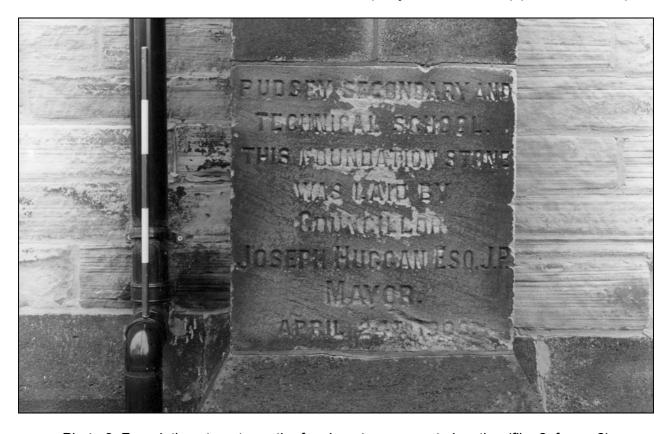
Foundation stone to north of main entrance, west elevation (film 2, frame 2)
